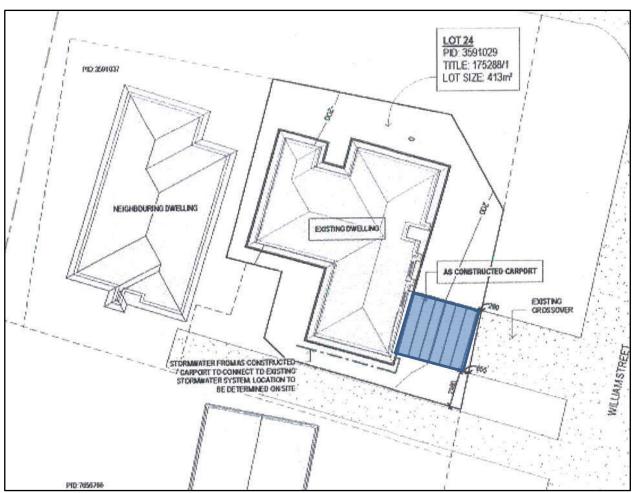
site plan (Engineering Plus, 2019); carport highlighted in blue
